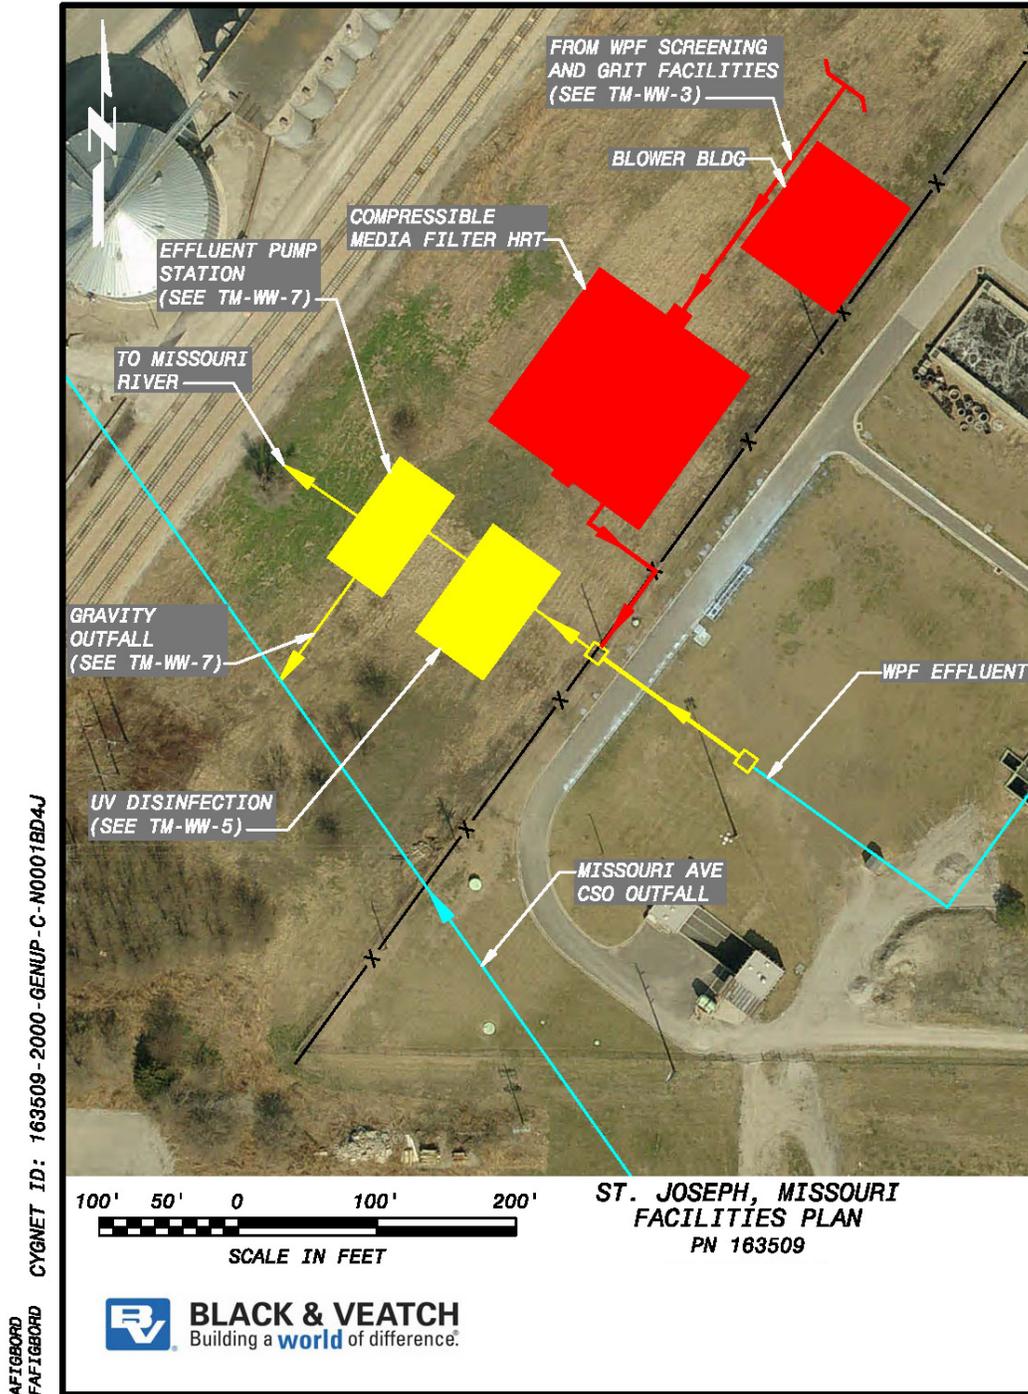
Preliminary Site Layout of Alternative 2: Compressible Media Filter
